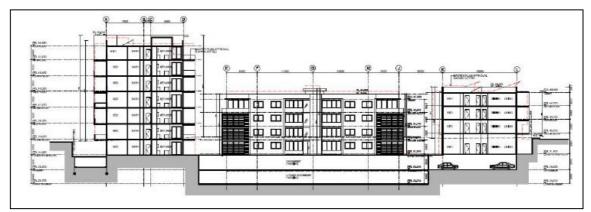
Section through Buildings 1, 2 and 3 of proposed development
